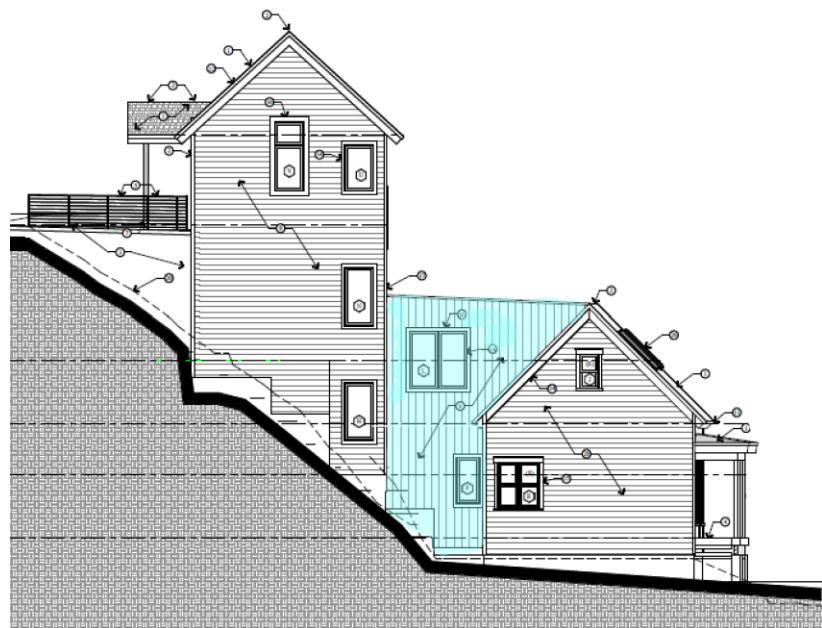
North elevation of Historic Structure and proposed addition, showing transitional element in blue.
